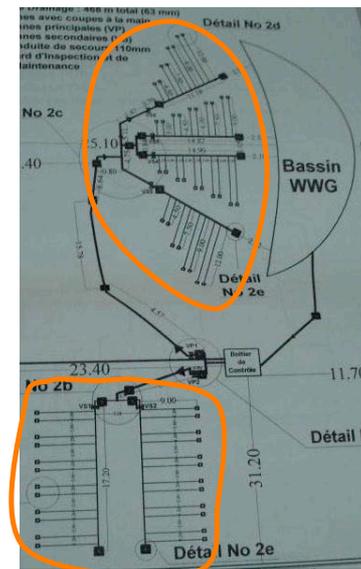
Plan of the WWG unit's drainage system: 468 meters drainage in 2 major areas (orange lines) and 6 sub-sections, gravity flow.
